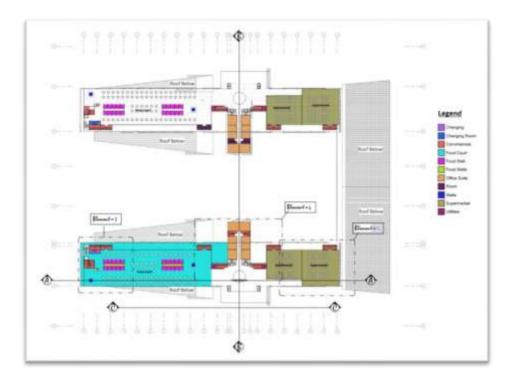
Proposed first floor plan Source: Researcher's design proposal, (2020)
